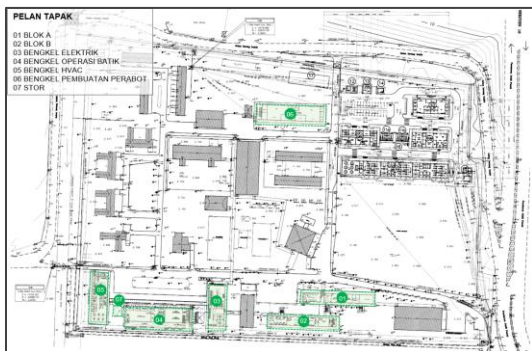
Site plan of SMPKVSA with highlighted scope of work.
